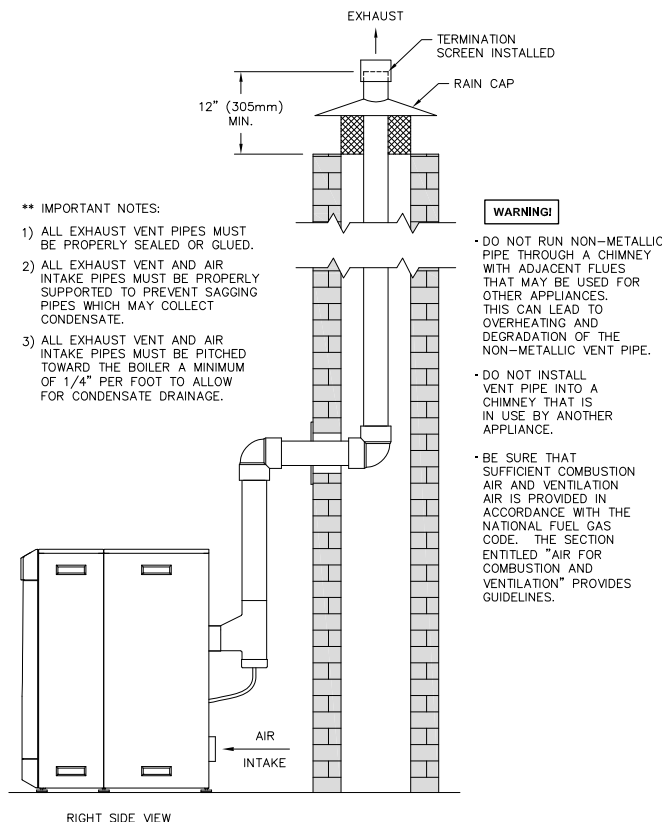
Vertical Exhaust Routed Through an Unused Chimney with Indoor Air
